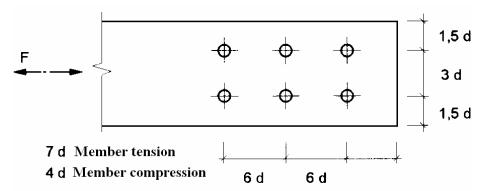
Minimum placement of bolts in joint. (NBR 7190/97), with d is diameter of bolt.
